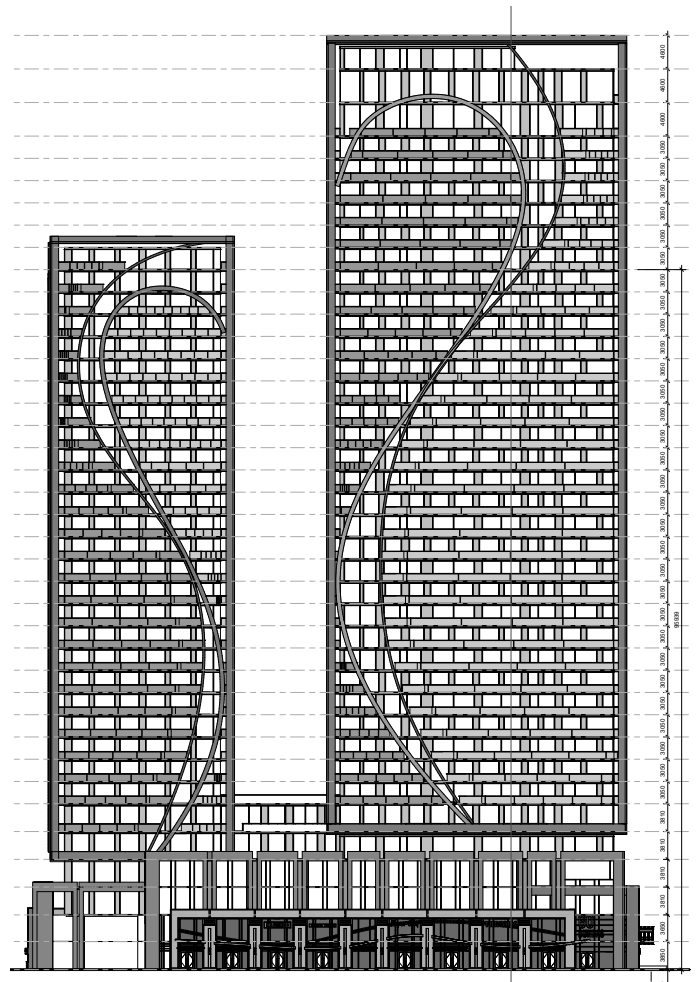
North Elevation (Prepared by: Chamberlan Architects)
